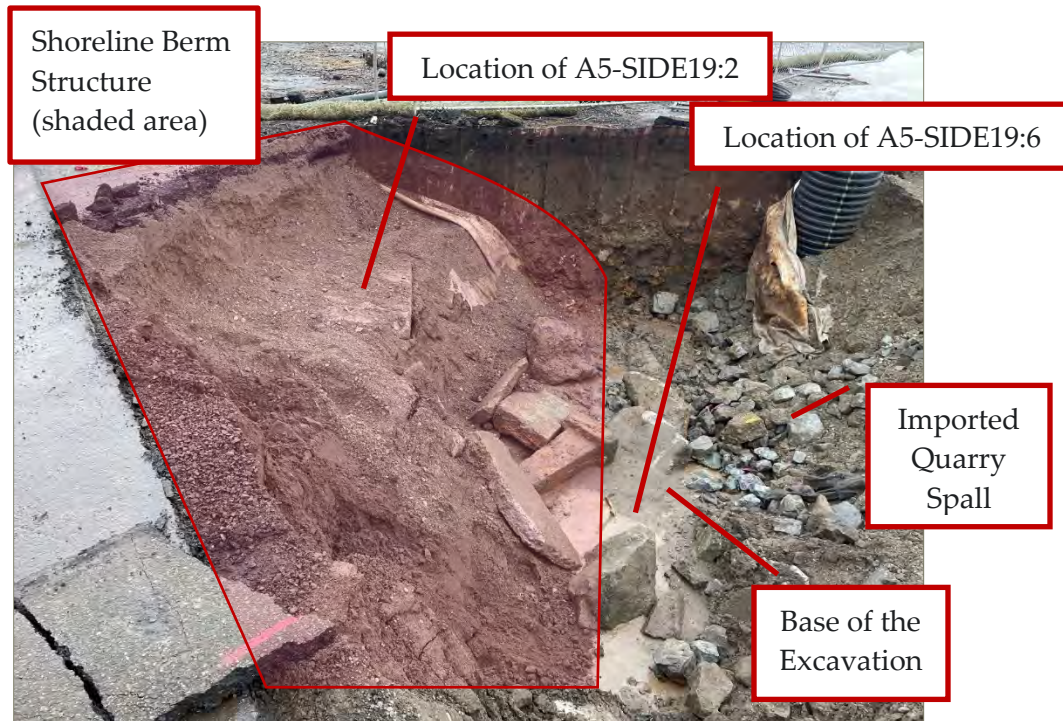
Extent of Excavation at the Northwest Corner of Area 5. View direction is north.
